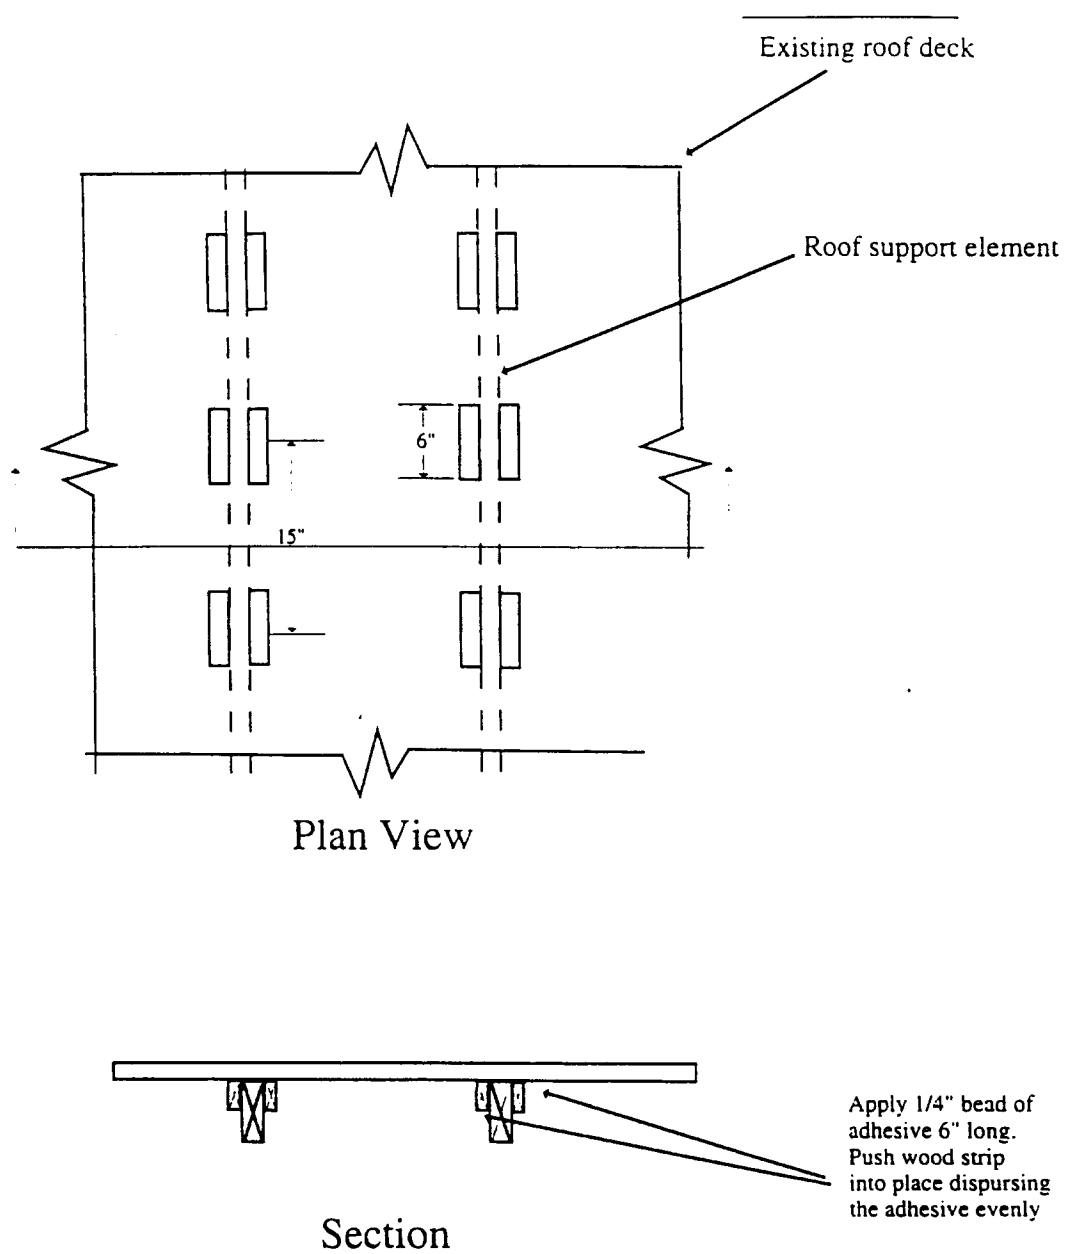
Installation of wood strips and adhesive to improve roof deck uplift resistance
